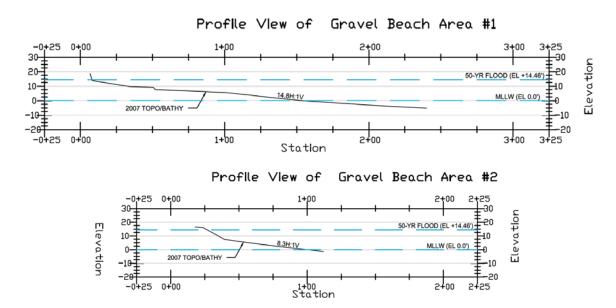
Existing Topography/Bathymetry at Gravel Beach Areas (Typical Section)
